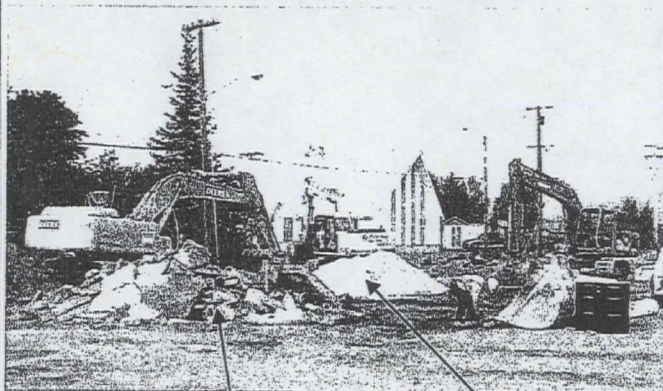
Stockpiled concrete and lined contaminated soil stockpile with backfilling excavation in the background
